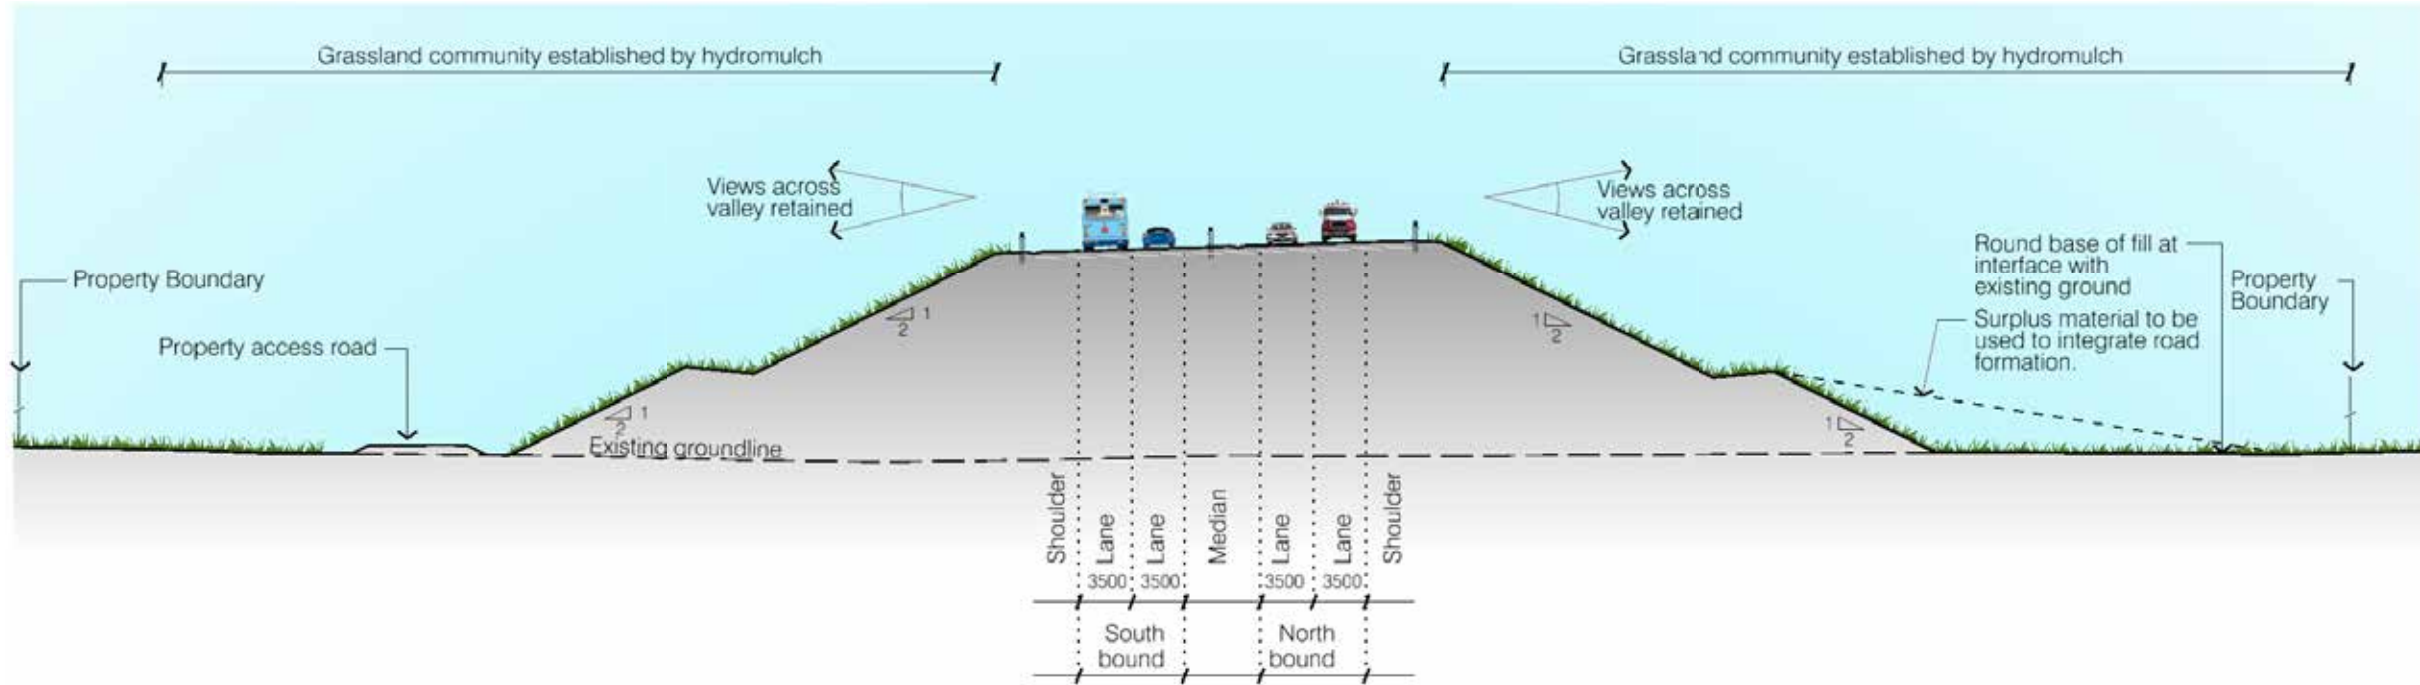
Road cross section at Ch. 9600 (Scale 1:500 @ A3)
